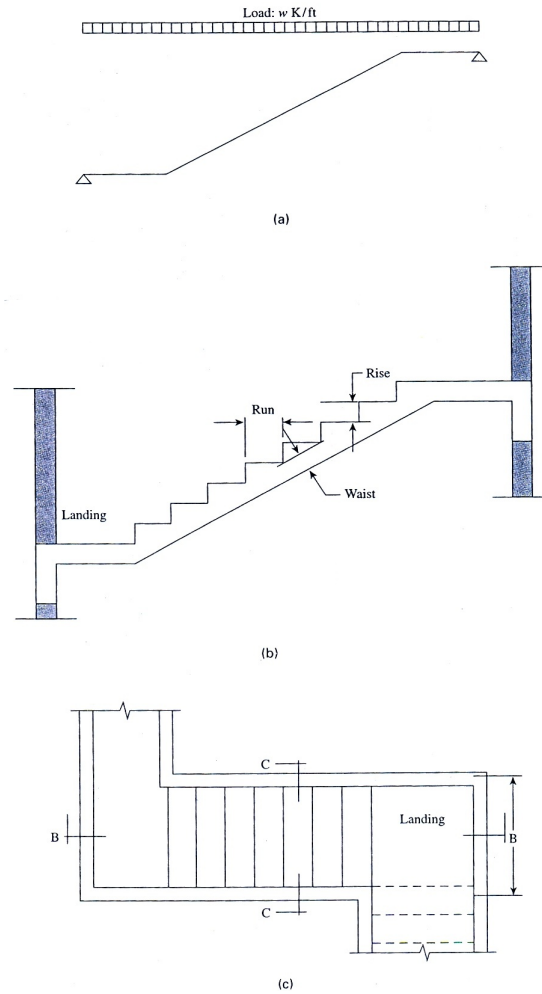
(a)Loads(b)Section at B-B(c)Plan
